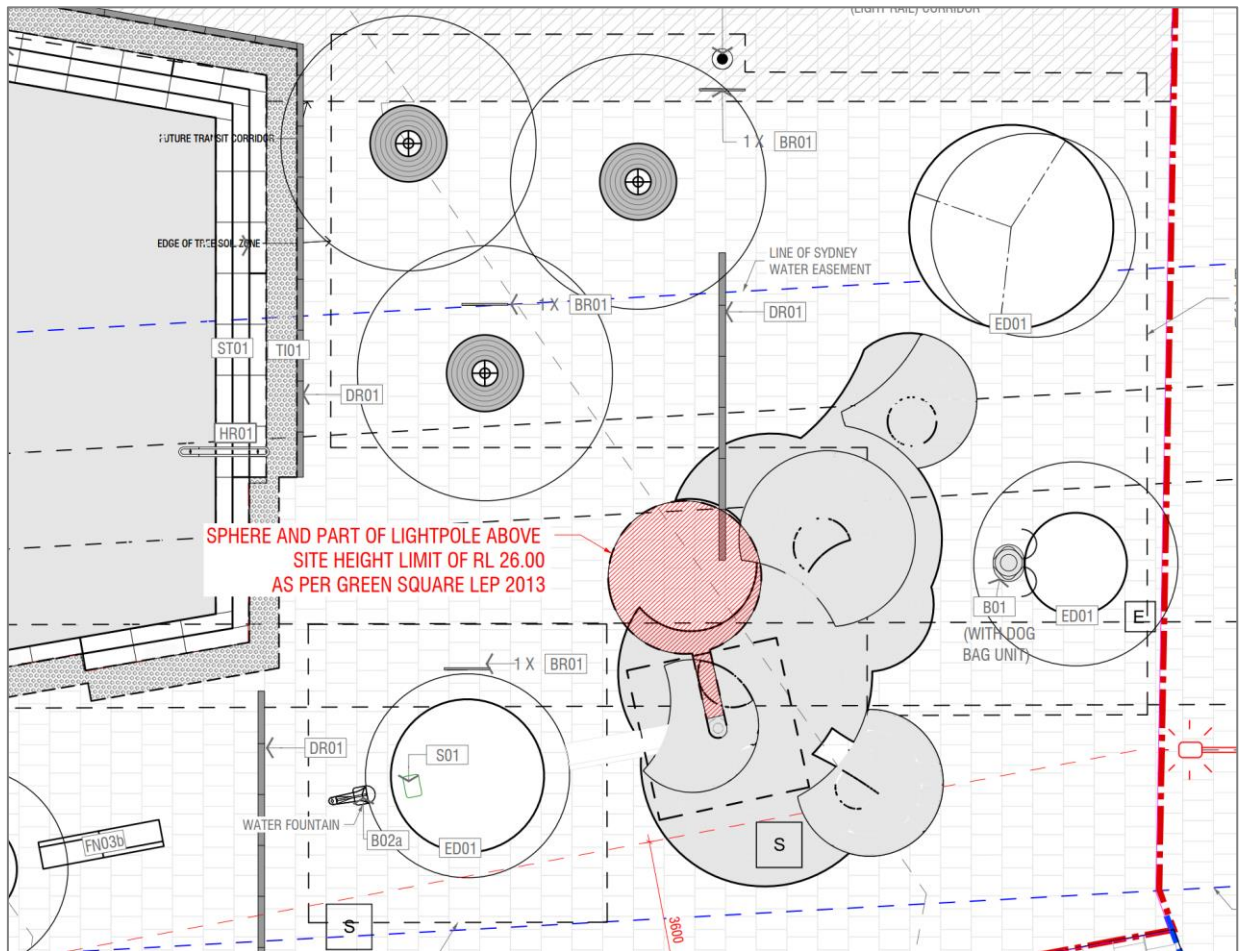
Extract of Height Plane Diagram, portions shaded red located above height limit (Source: Shop 1 Projects)
